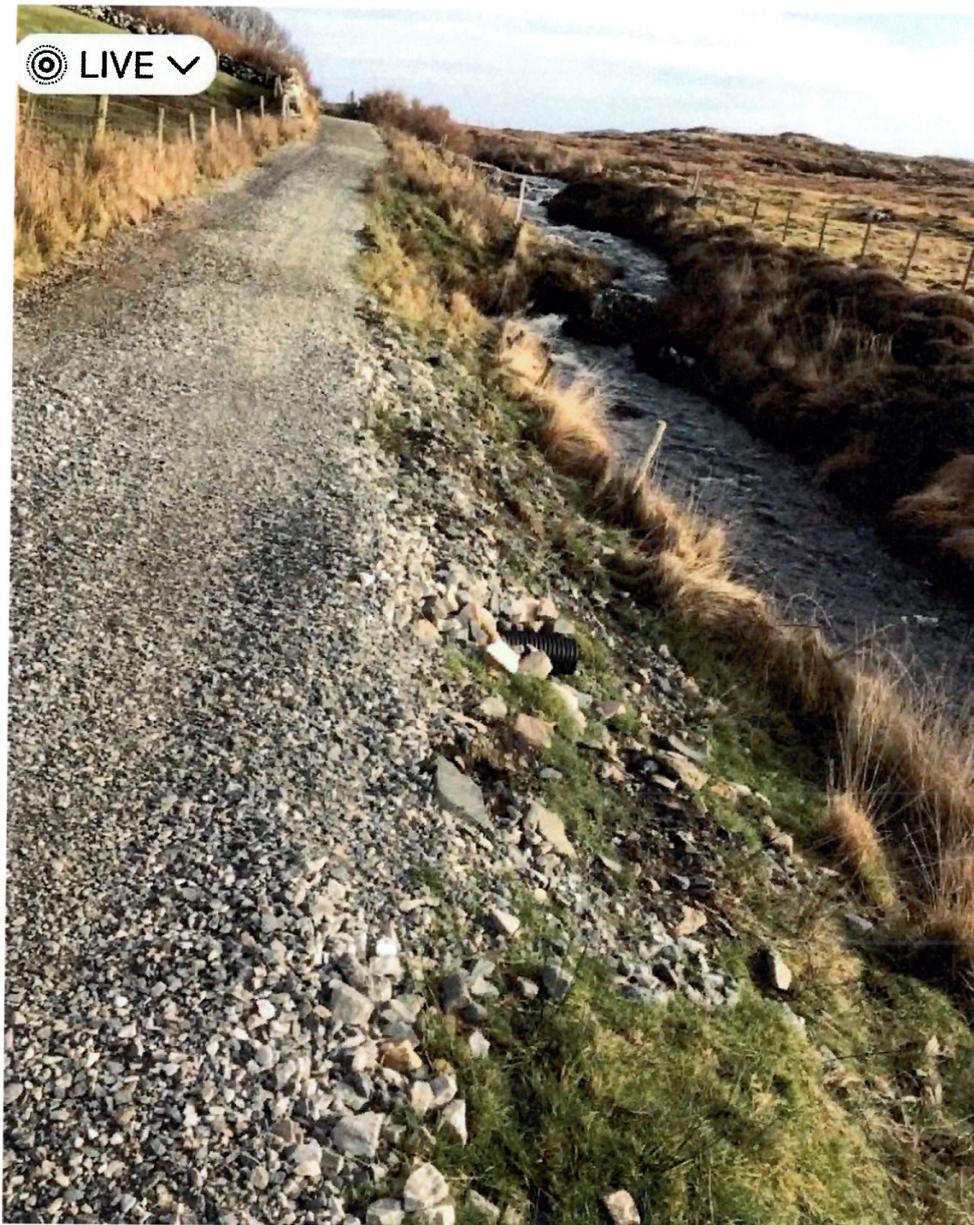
showing debris from the scraping of the road spread along the riverbank, with a visible impact on riverbank vegetation and extending to the water's edge. In the centre of the photo is a perforated drainage pipe discharging from under the road onto the riverbank and thus into the river and SAC. A second discharge pipe can just be seen above it.
